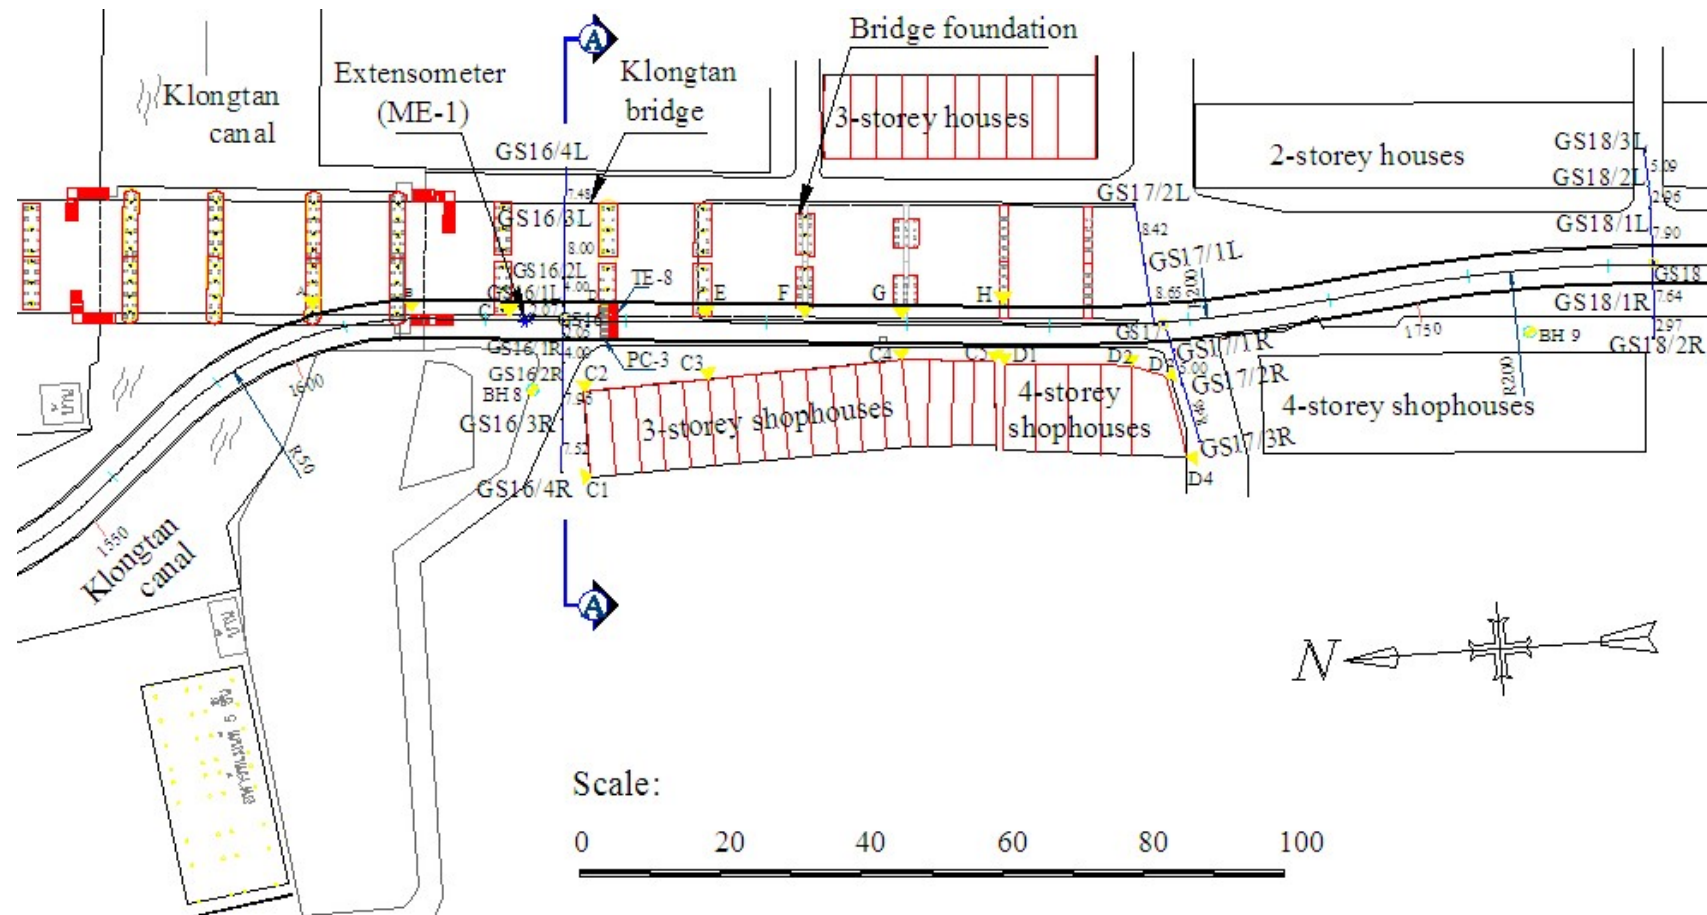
Klongtan bridge area (BMA flood diversion tunnel project)
